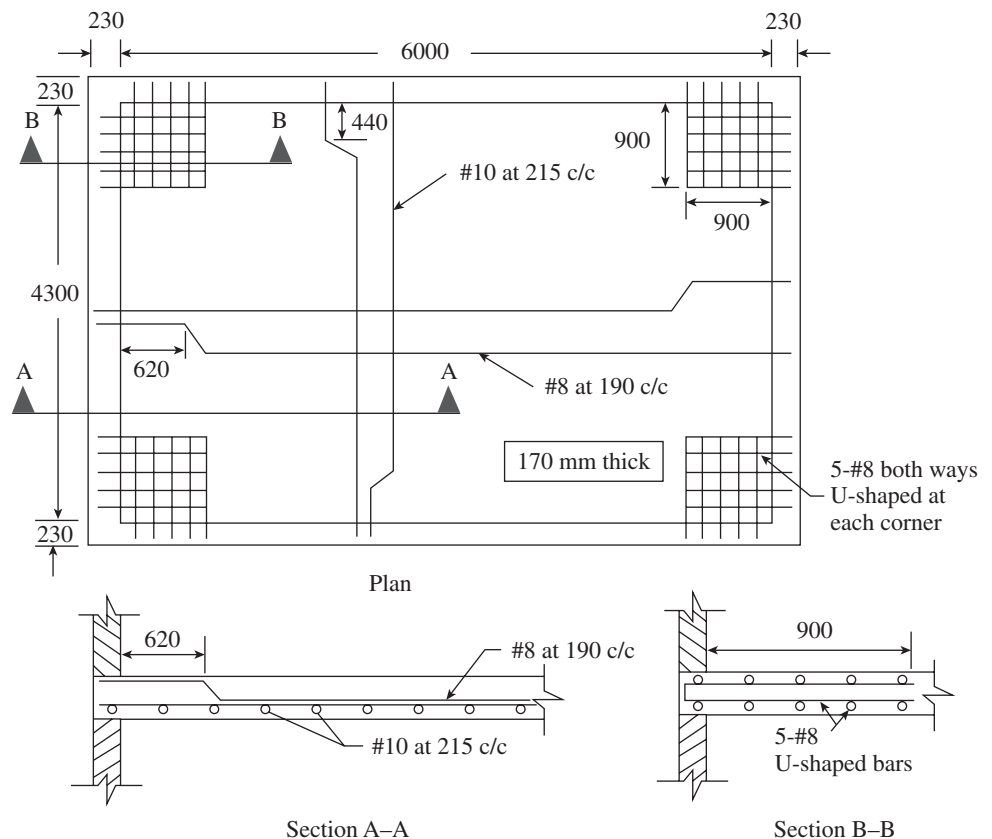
Reinforcement detailing for slab of Example 10.3
